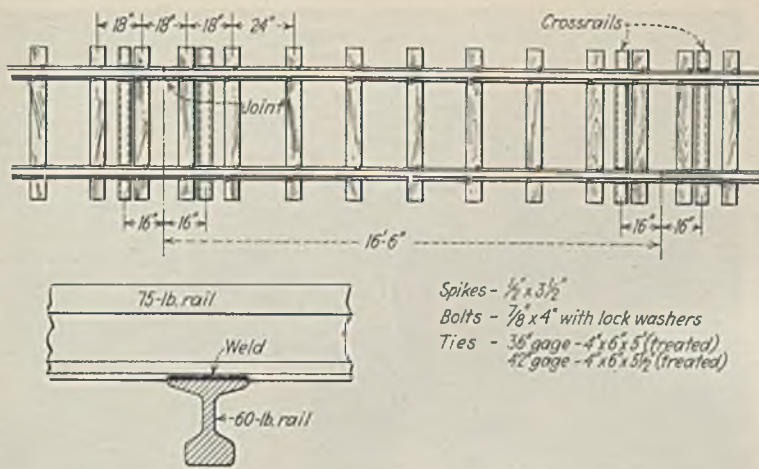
Method of applying cross rails in building 75-lb. main-line track
